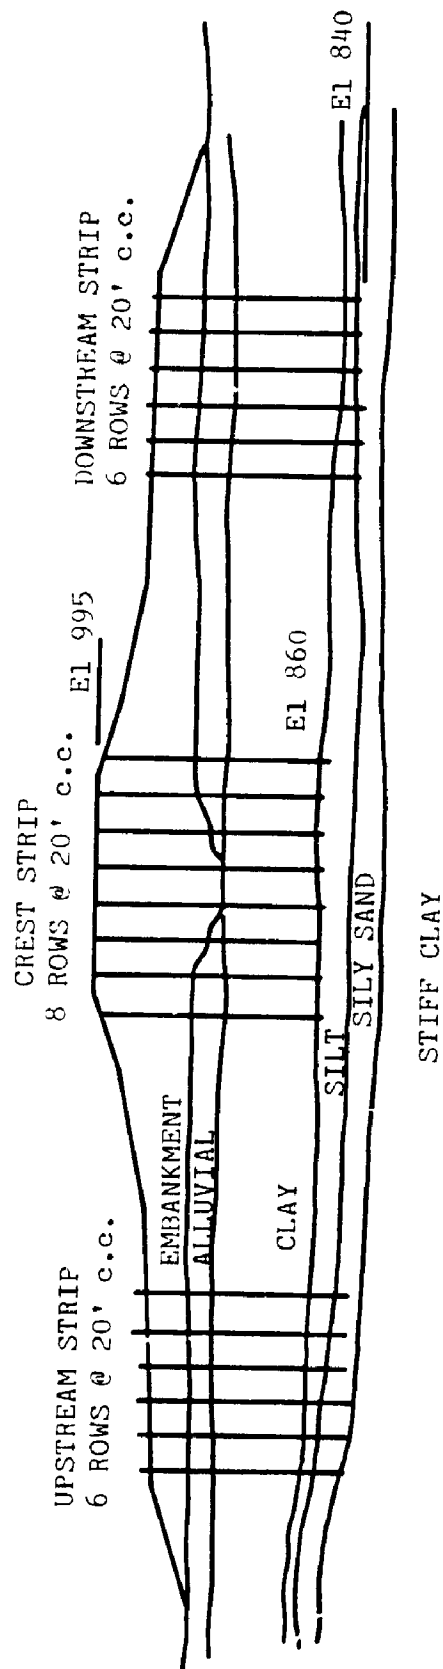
SECTION OF DAM SHOWING ELECTRO-OSMOTIC INSTALLATION, WEST BRANCH DAM PROJECT
